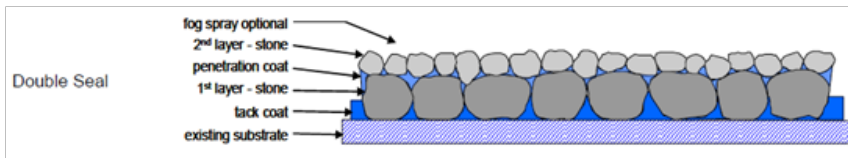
Double-layer chip sealed road pavement cross-section (SANRAL 2007)
